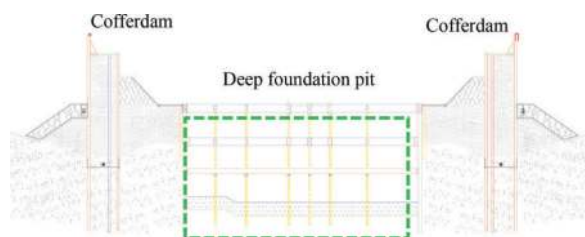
Typical profile of temporary cofferdam and deep foundation pit.
